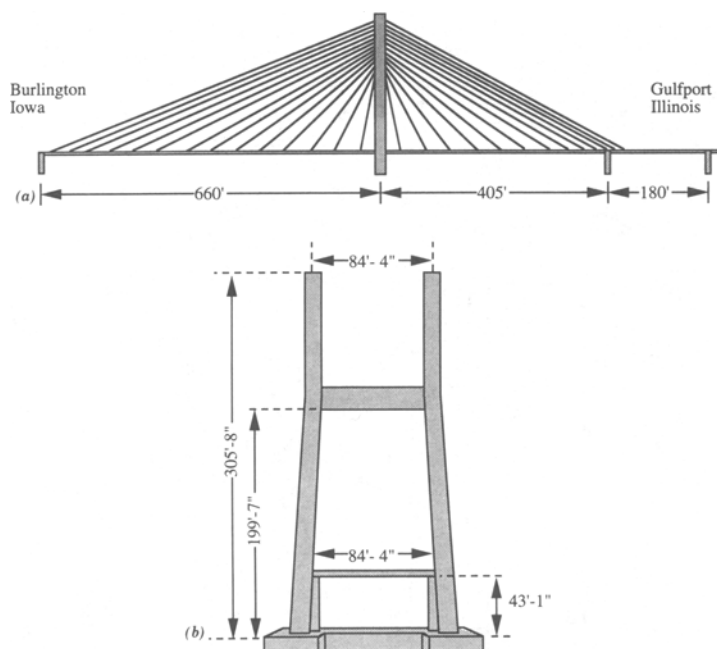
Profile and Pier of Burlington Cable-Stayed Bridge: (a) Mainspan Profile; (b) Tower Configuration
